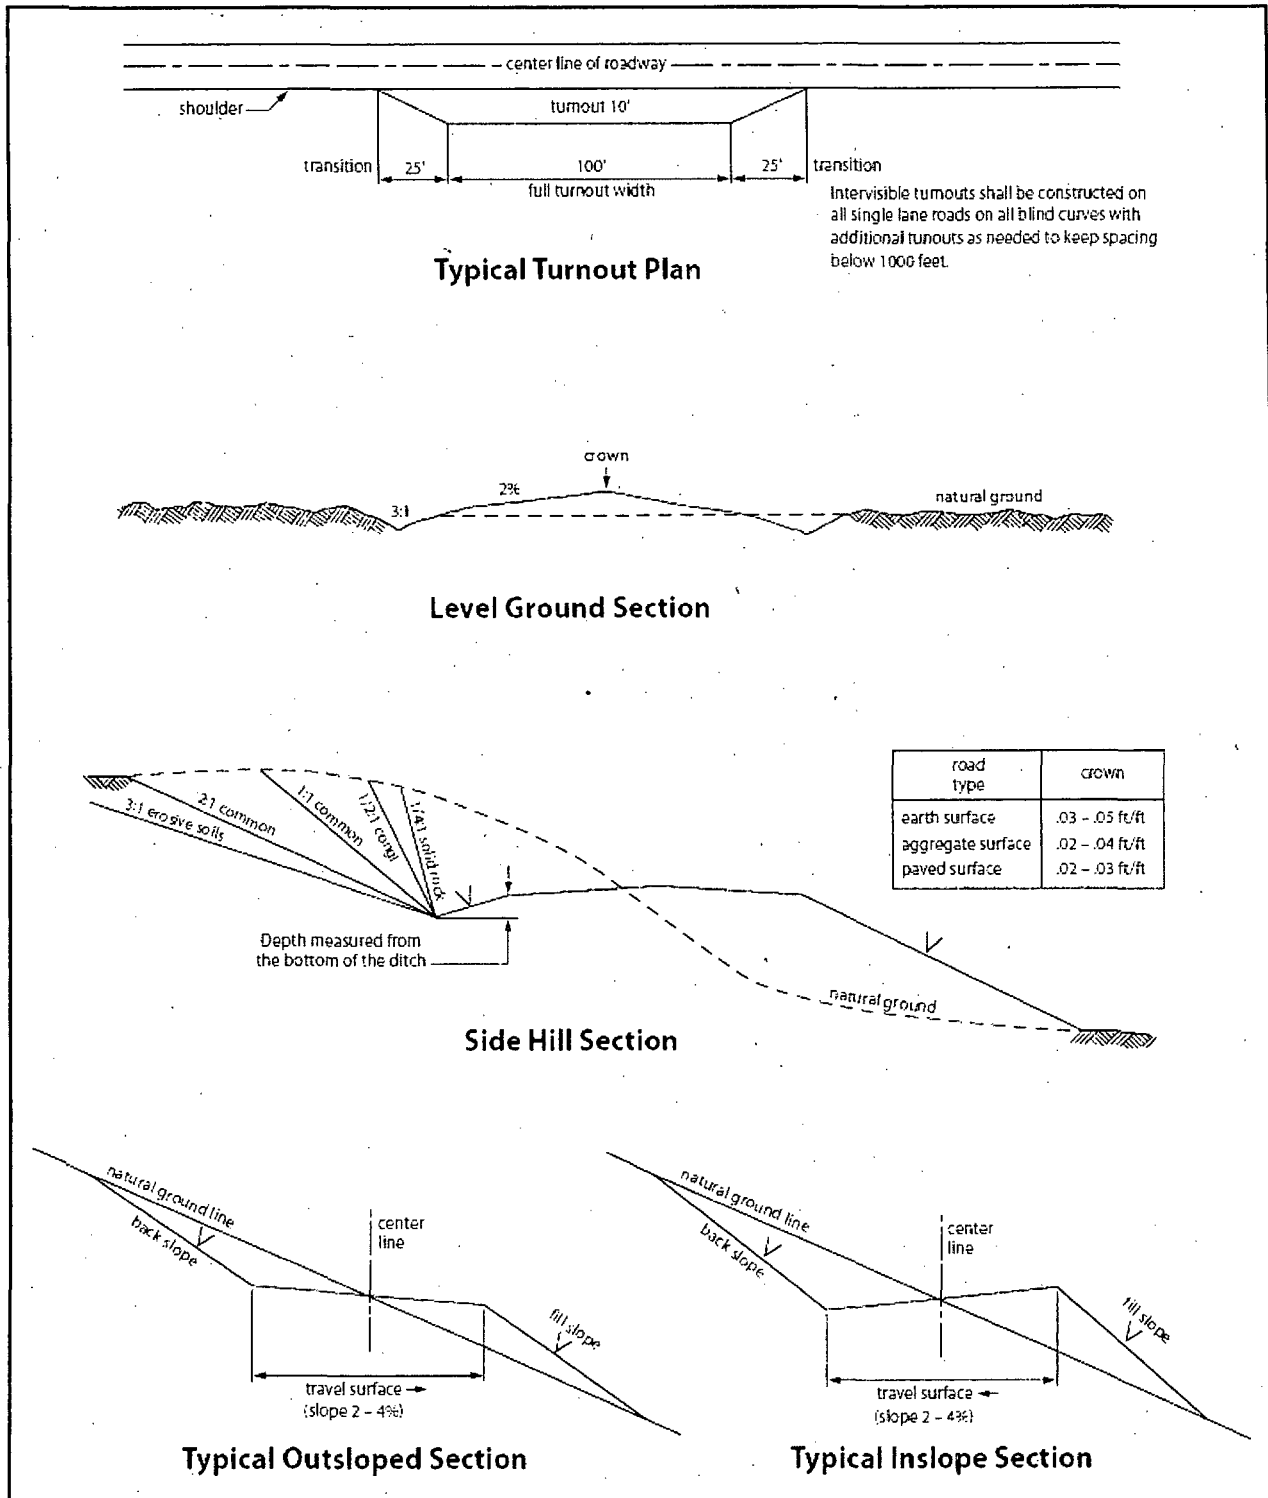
Cross-sections and plans for typical road sections representative of BLM resource or FS local and higher-class roads.
